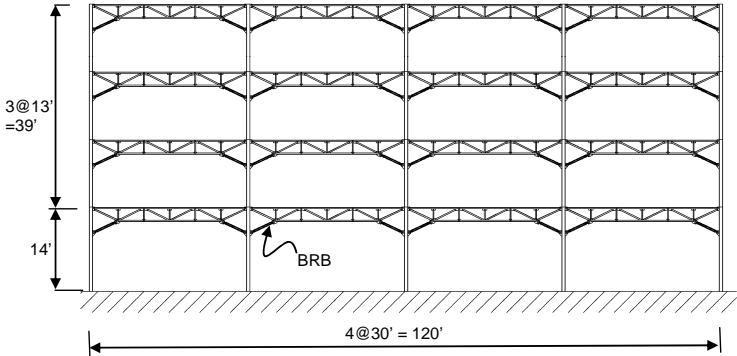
Elevation View of the 4-Story Truss Moment Frame
